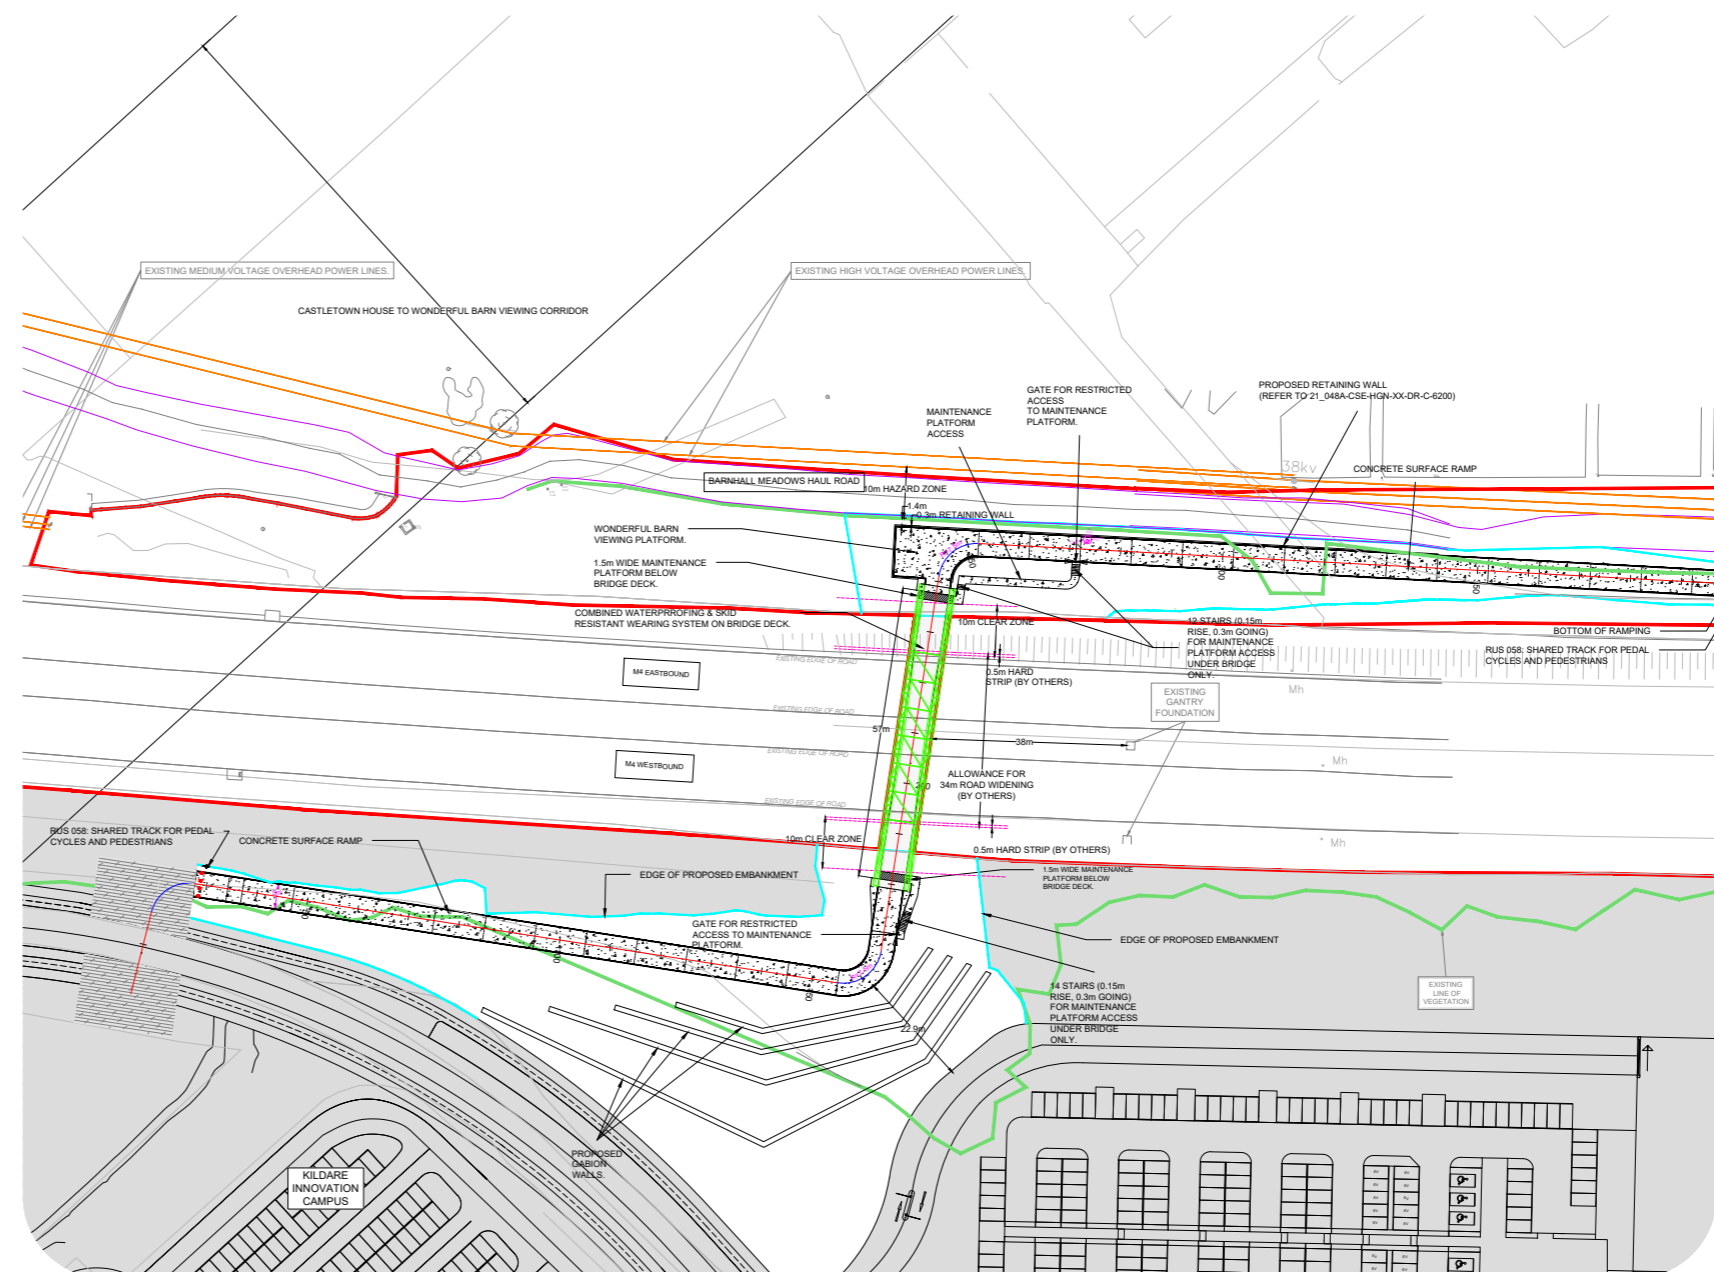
; M4 Pedestrian Cycle Bridge Plan Connecting the Innovation Campus to the Wonderful Barn
